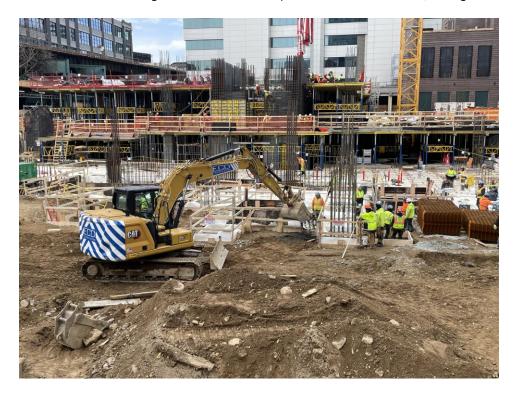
ECD backfilling with 0.75-inch imported stone in the central part of the site (WCG F/E, facing north).
